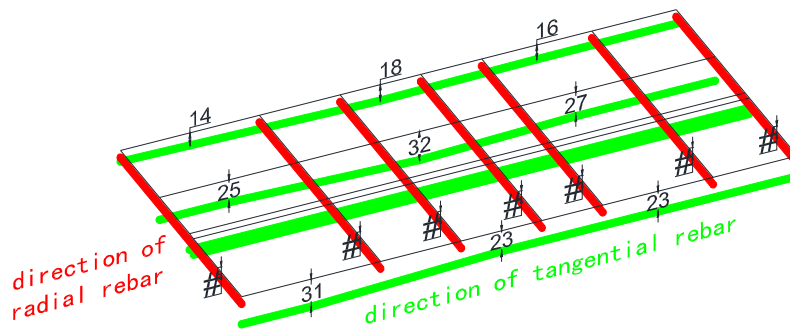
3D diagram of concrete cover in testing zone 3 (mm).
